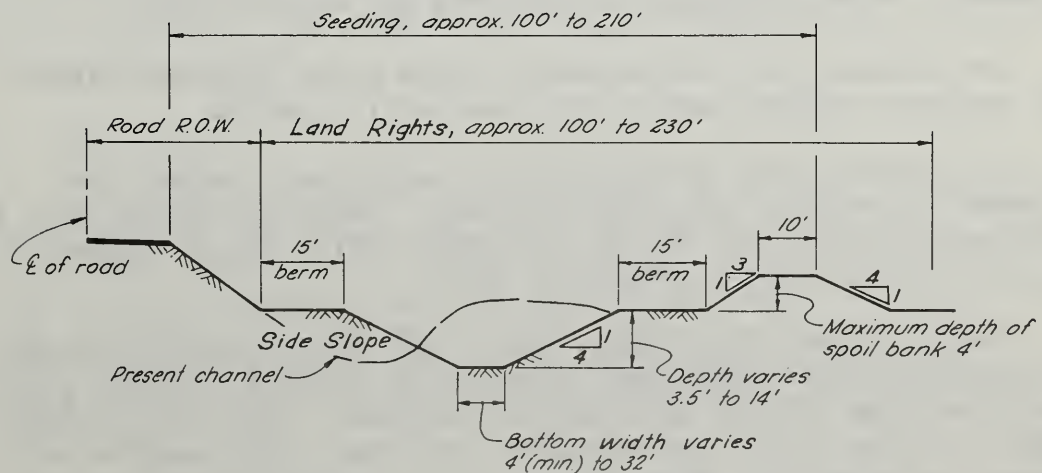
Typical Cross Section of Planned Channel with Adjacent Road.
